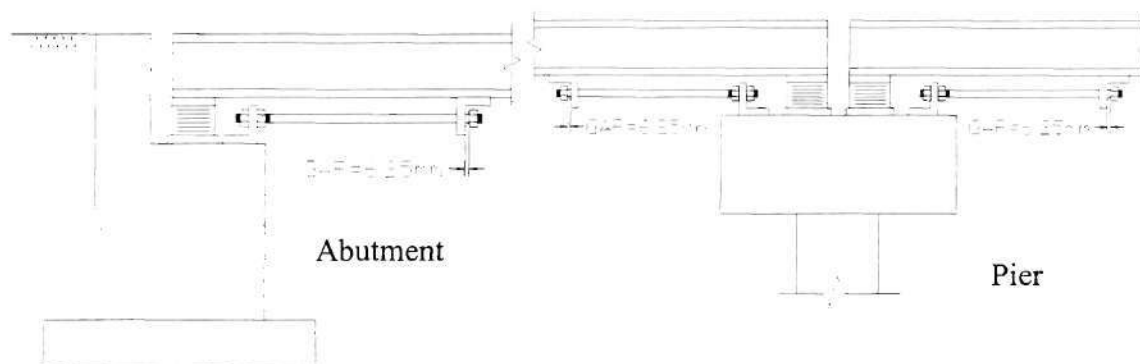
Configuration of Shape Memory Alloy Restrainer Bar Used in Multi-Span Simply Supported Bridge at Abutments and Intermediate Piers.
